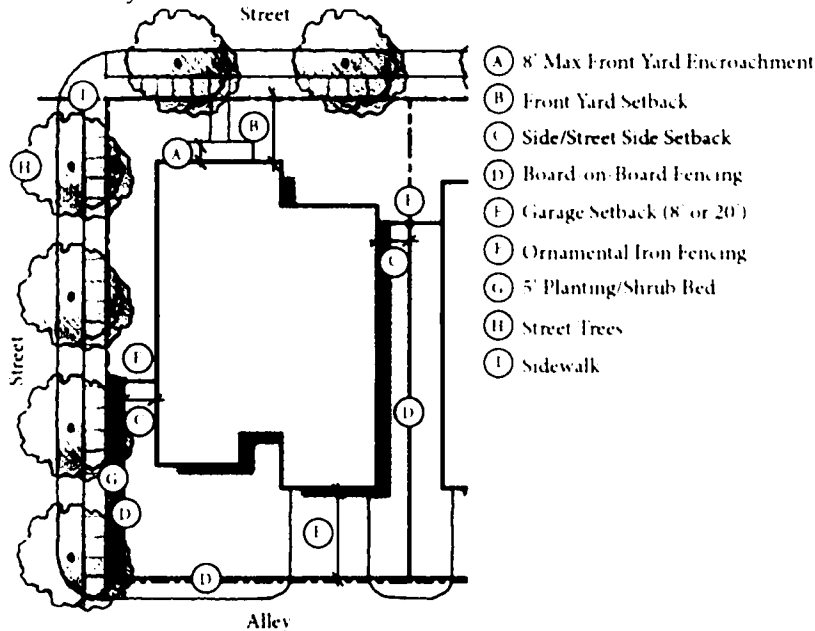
[Exhibit A - Garage setback conditions - Twenty-foot (20') and eight-foot (8').]
